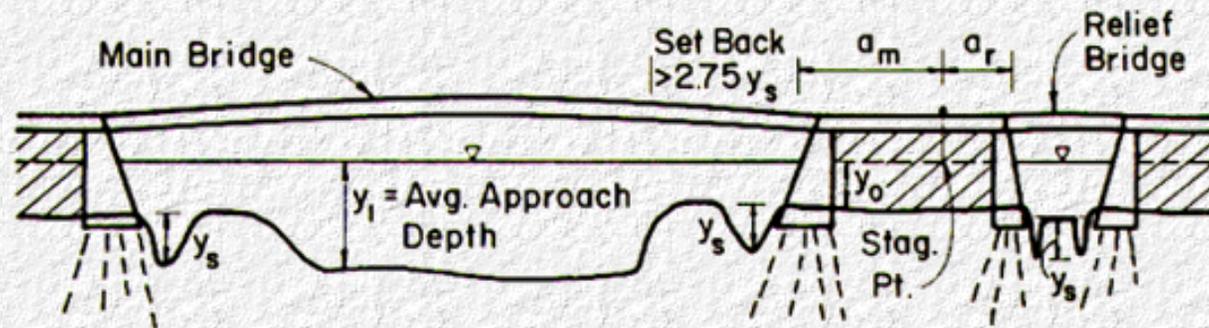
Bridge Abutment Set Back from Main Channel Bank and Relief Bridge
